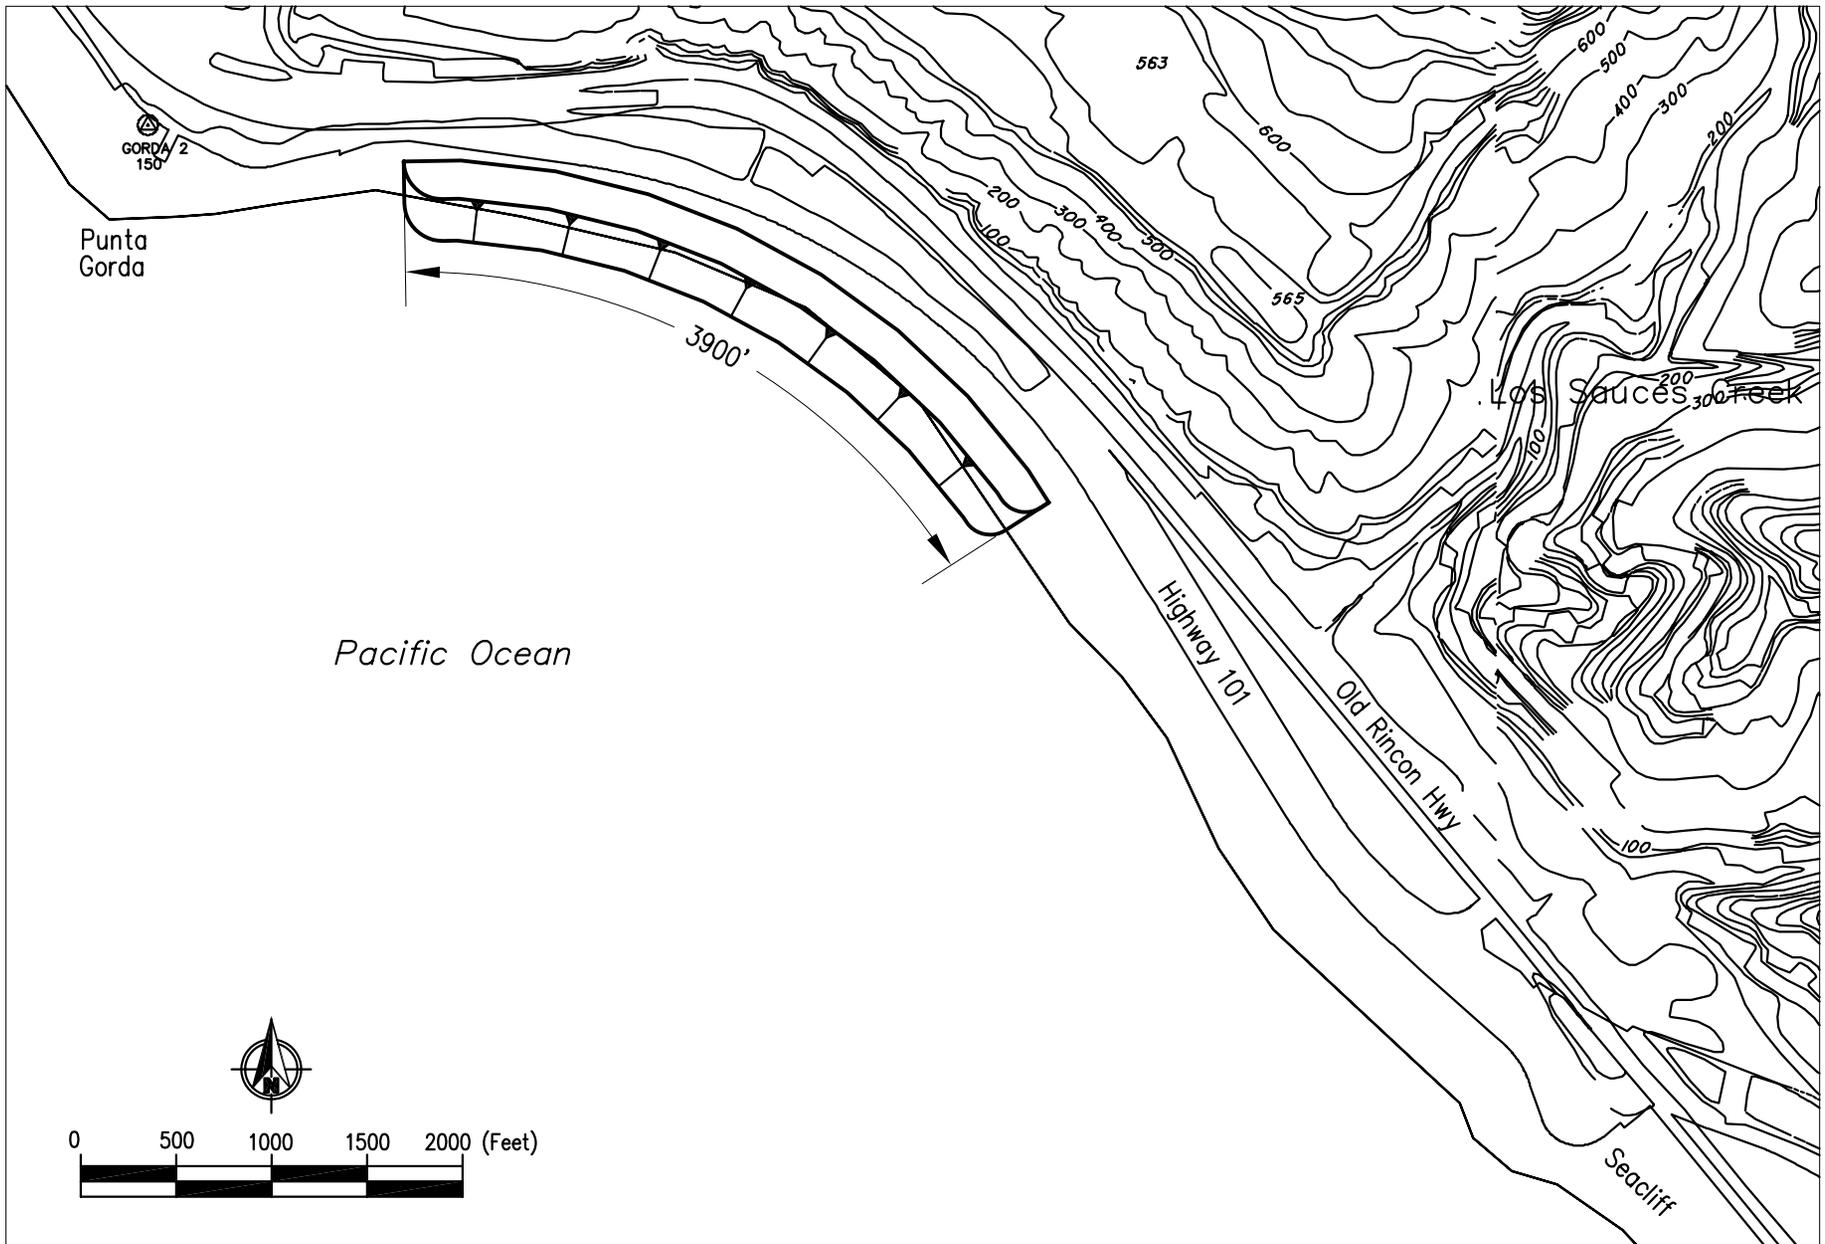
Oil Piers Beach - Beach Fill Location
